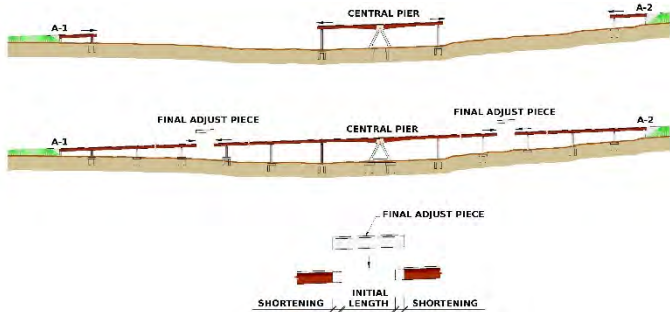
Shrinkage deformation reduction by adjustment of erection process
